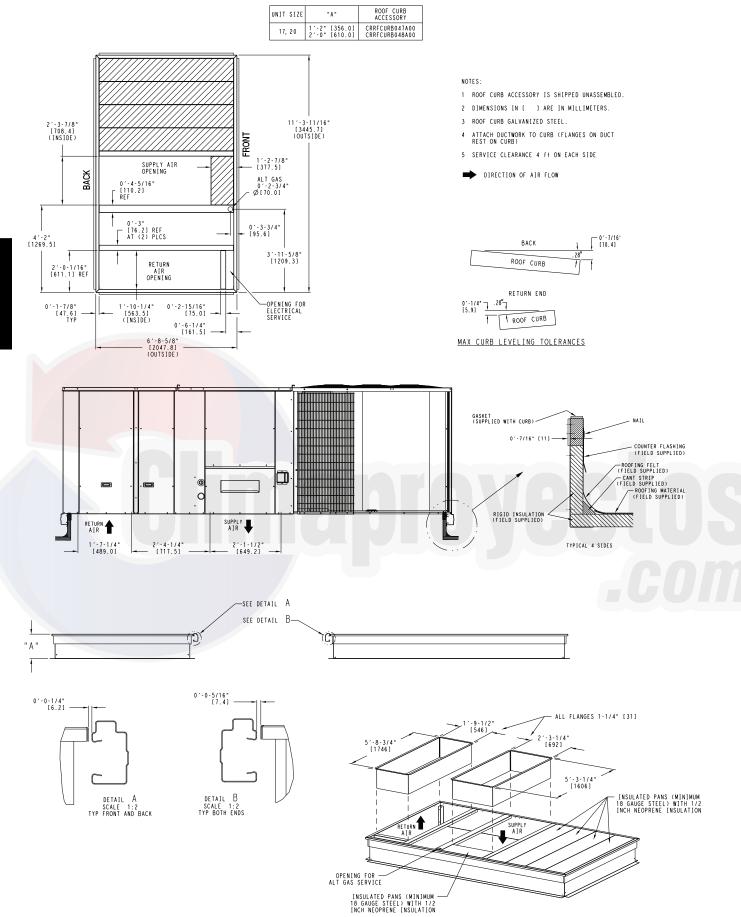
Roof Curb Details - 17 and 20 Size Units
